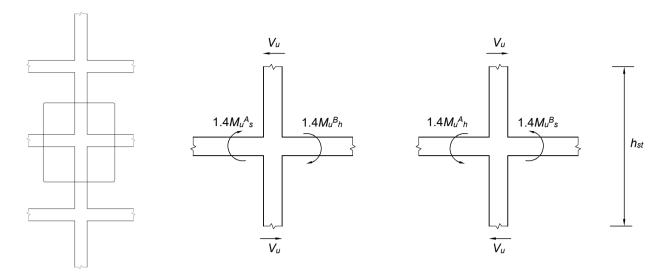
EQUILIBRIUM DESIGN SHEAR FORCE DEMAND ON COLUMN WHEN PLASTIC HINGES ARE FORMED AT BEAM ENDS
